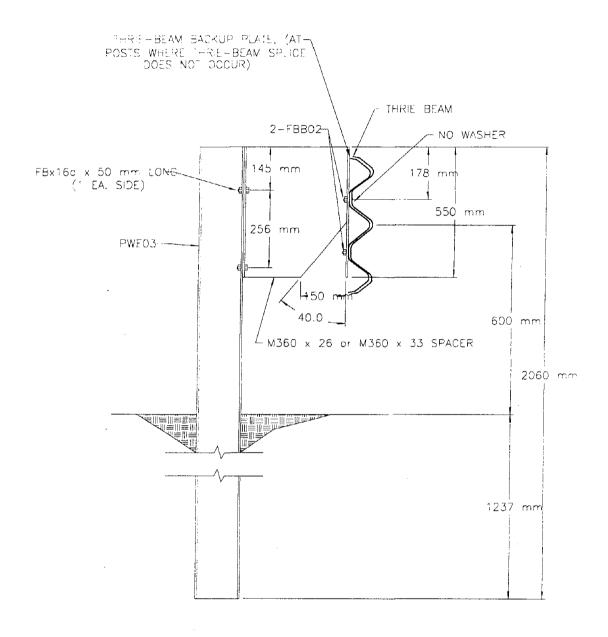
Cross-section of the thrie-beam (G9) guardrail system.
